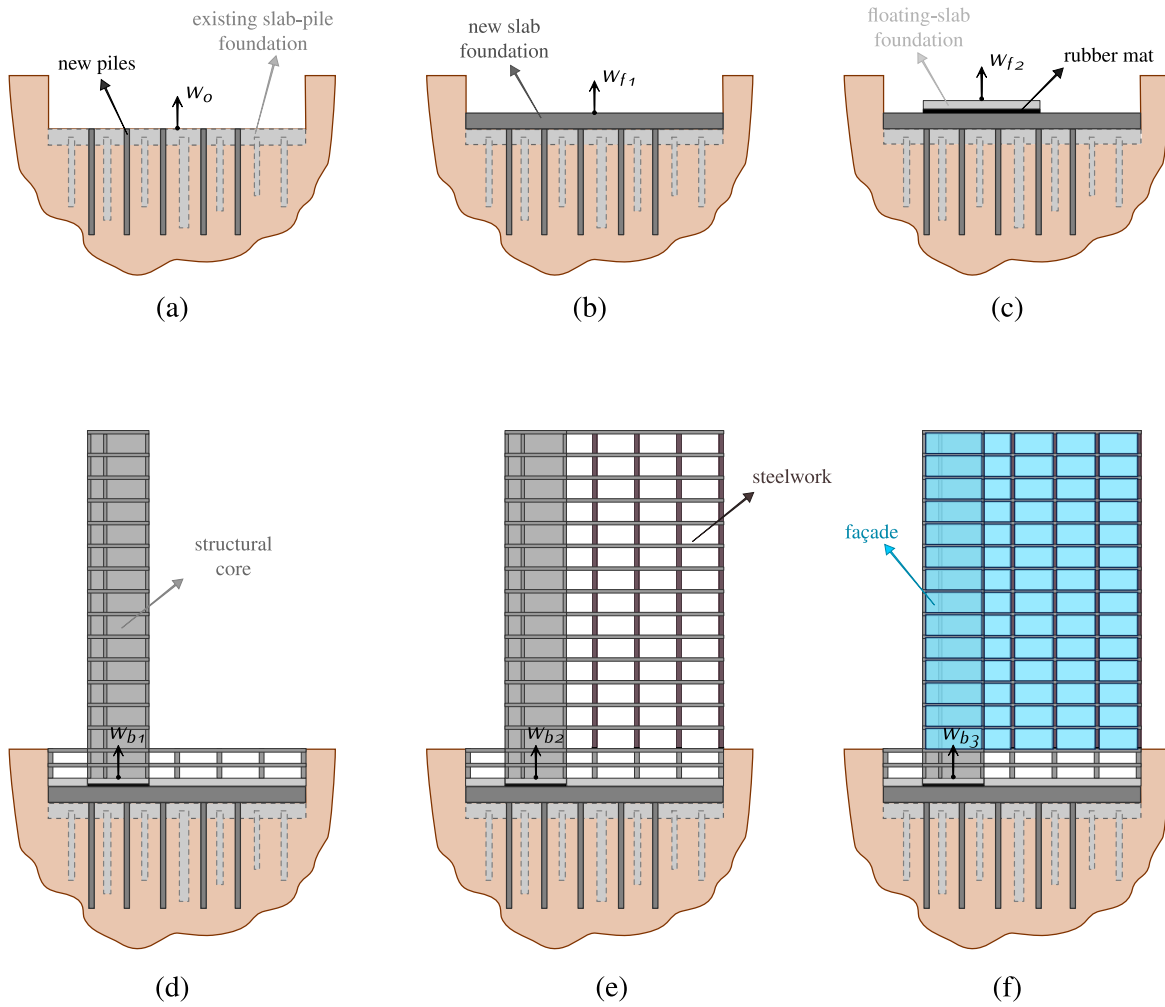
A schematic illustration of the construction stages and the associated measurement sessions for the case study: (a) new piles are cast in-situ on the existing slab-pile foundation with the resulting vibration levels w_o ; (b) part of the new concrete slab foundation is cast in-situ with the resulting free-surface vibration levels w_{f1} ; (c) a floating-slab on a layer of elastomeric material is built, for isolating the structural core, with the resulting free-surface vibration levels w_{f2} ; (d) after the construction of the structural core, the vibration levels w_{b1} at the foundation-building interface; (e) the structural steelwork is completed and the vibration levels are labelled w_{b2} ; (f) finally, the façade is completed and the vibration levels w_{b3} are registered at the foundation-building interface.
